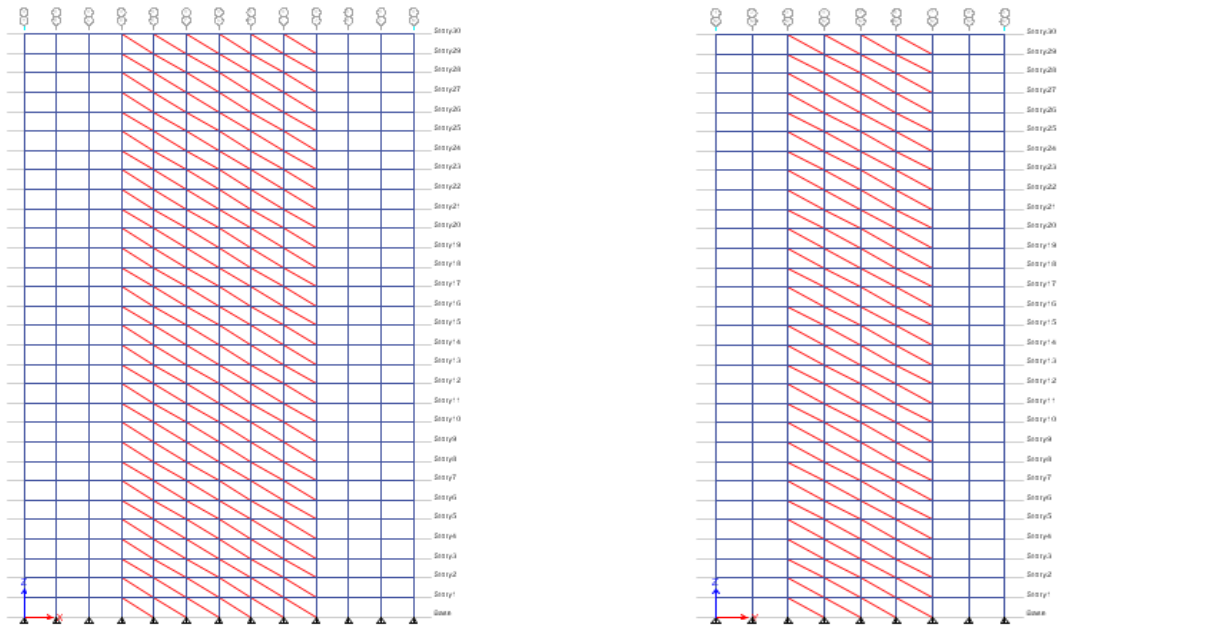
Elevation of tube in tube structure with diagonal bracing in X and Y direction
